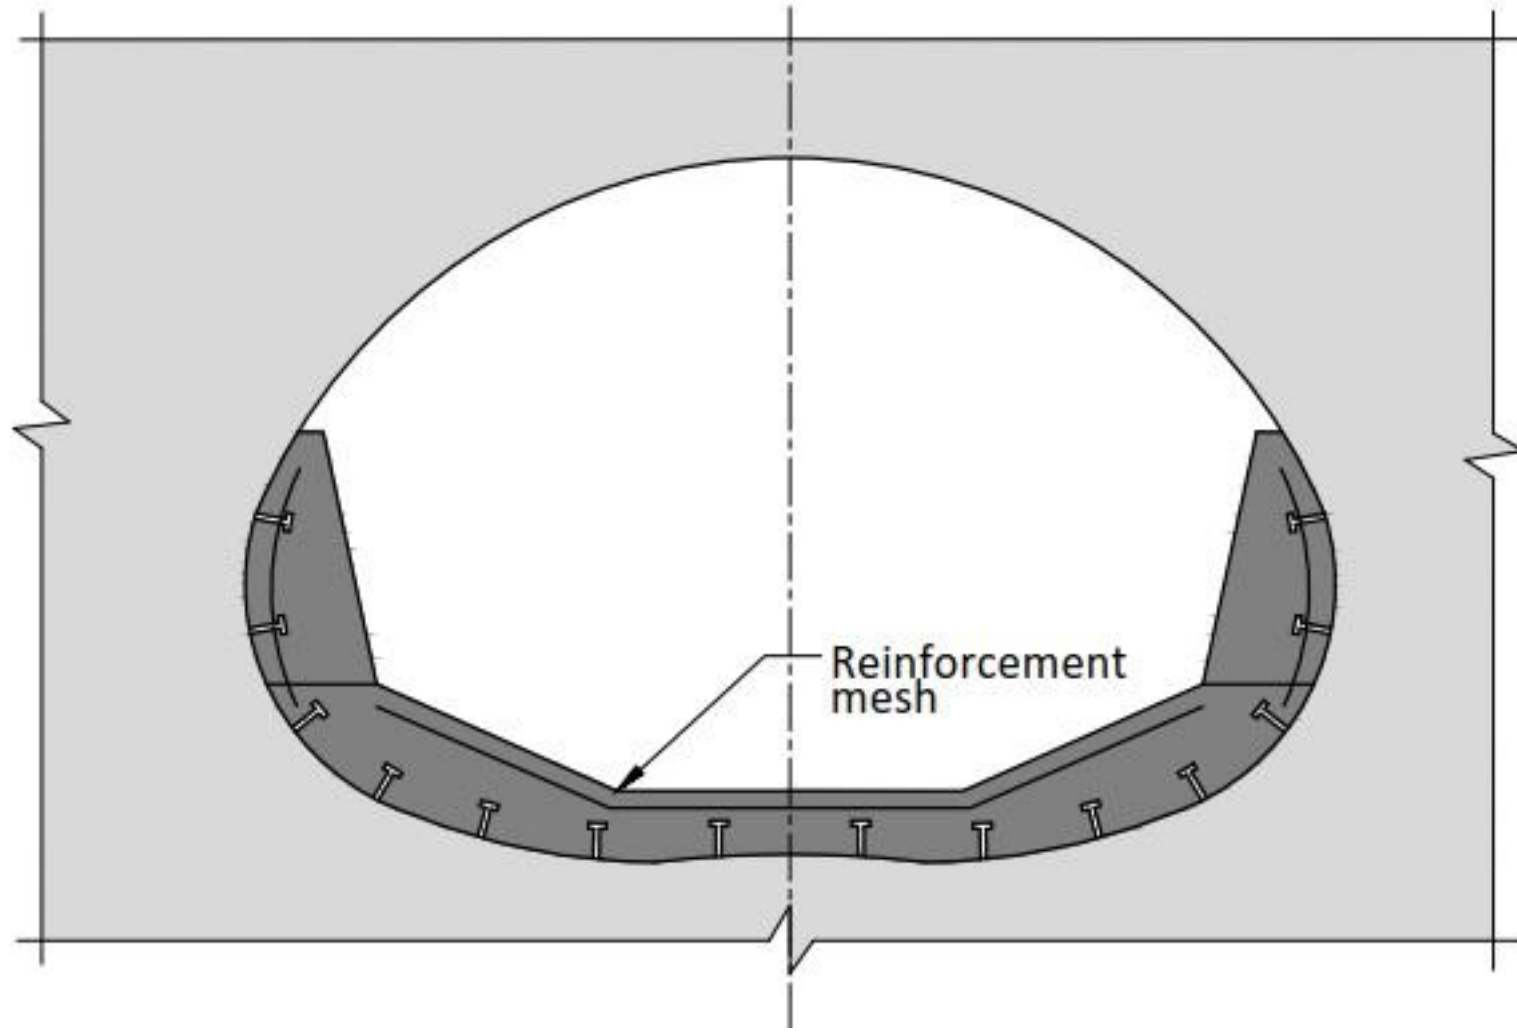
Shotcrete reinforced concrete paving (after Abdel-Sayed et al, 1993)
